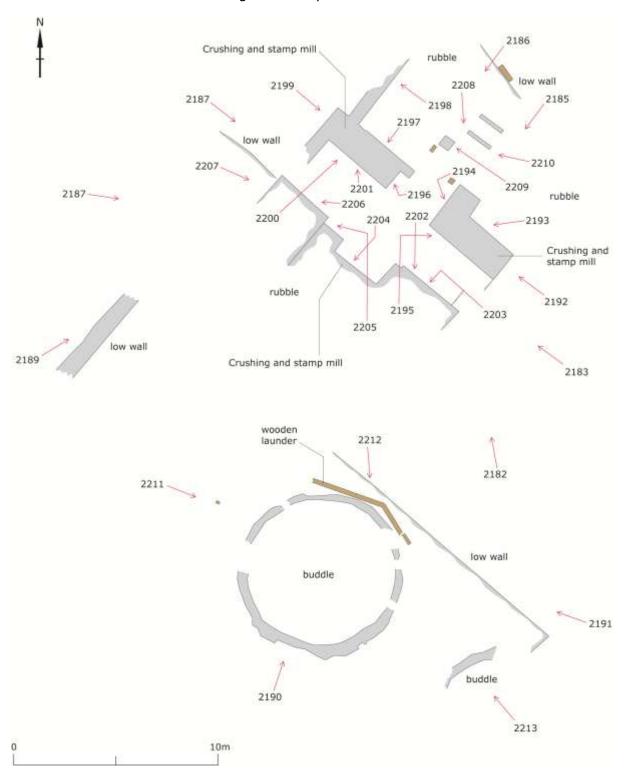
Plan of the Crushing and Stamp Mill photographic survey.
